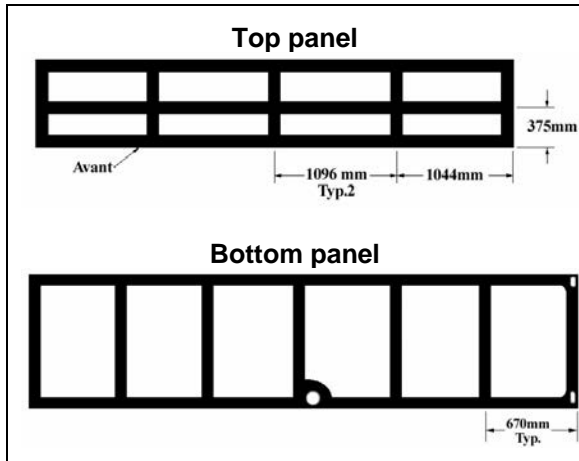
TOP AND BOTTOM PANEL INSTALLATION - SIKA 206 G+P APPLICATION
